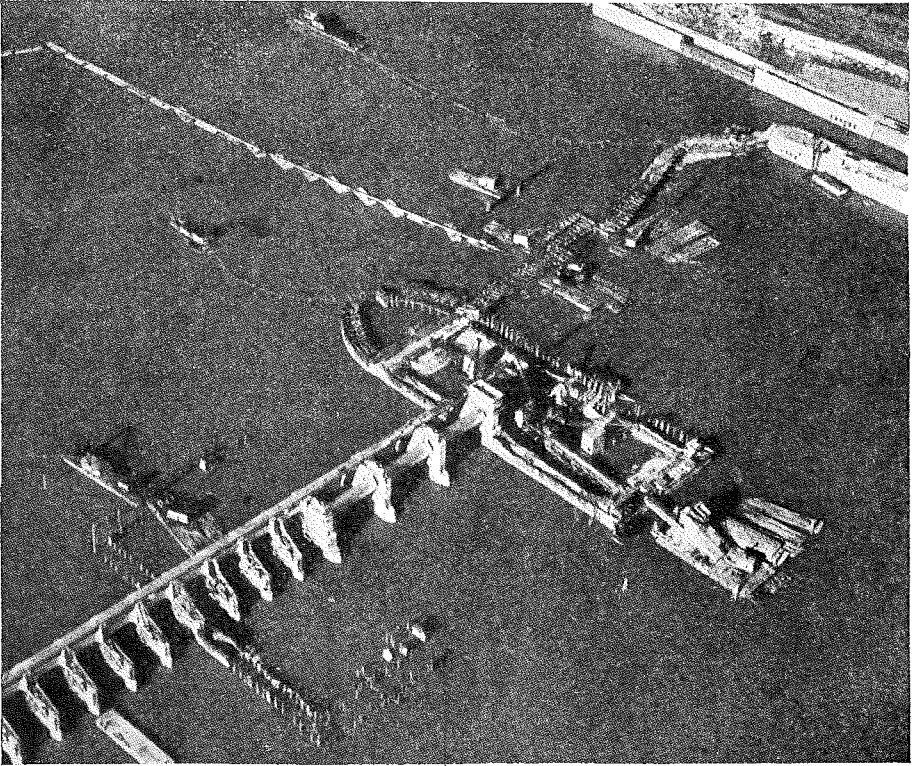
CLOSURE OPERATIONS FOR FINAL COFFERDAM STAGE, LOCK AND DAM NO. 26, UPPER MISSISSIPPI RIVER.
